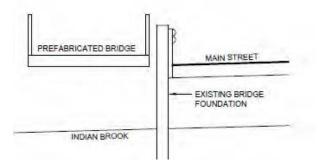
Alternative D-1 - Prefabricated Bridge
